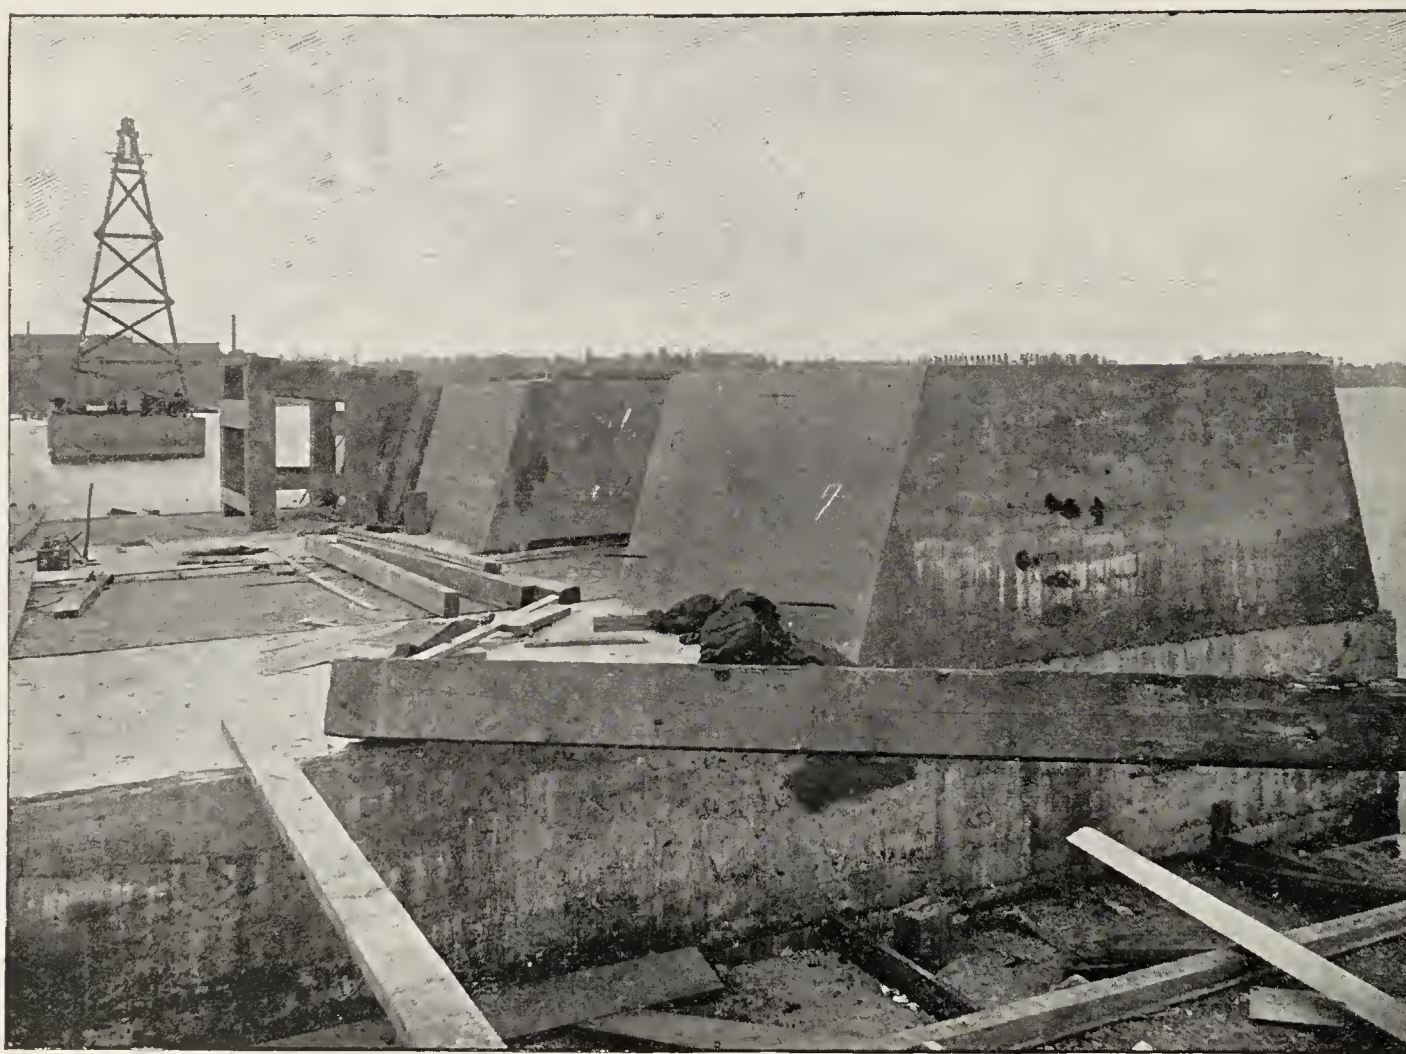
Section Completed and Concrete Parapet Erected on Main Structure, U. Breakwater, Cleveland, O.
